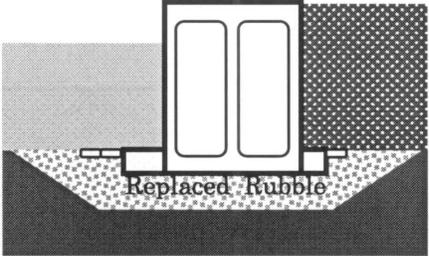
Prefabricated Steel Sheet Pile Cellular-bulkhead Quaywall
